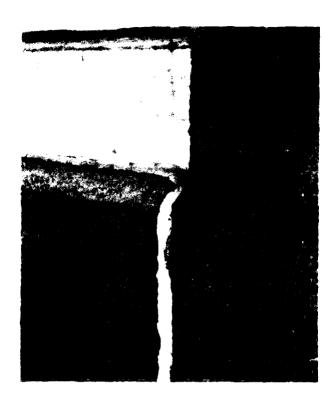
Failure of sealant joint where open-celled backer rod was used.
